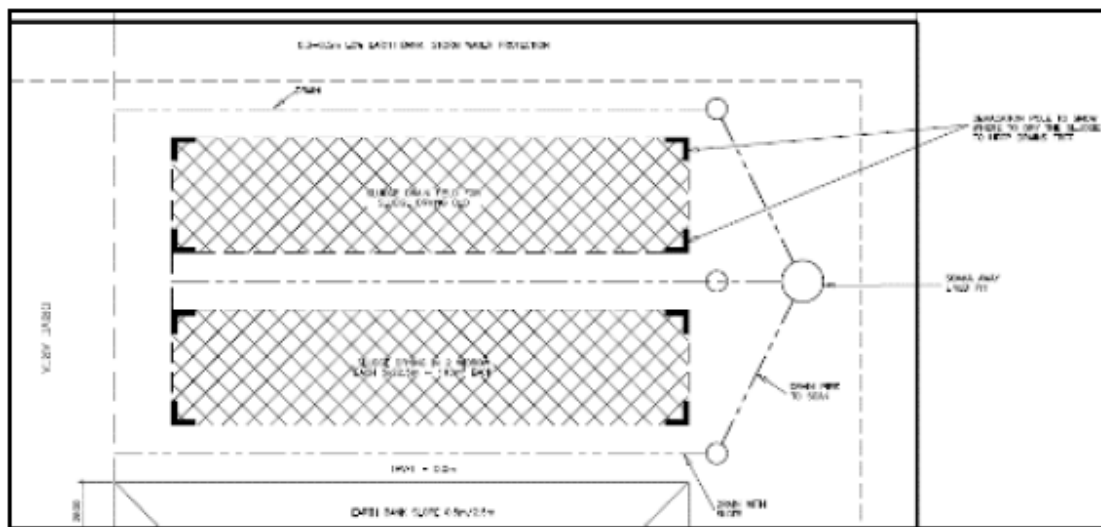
Sludge drying bed next to the settling-thickening pond
